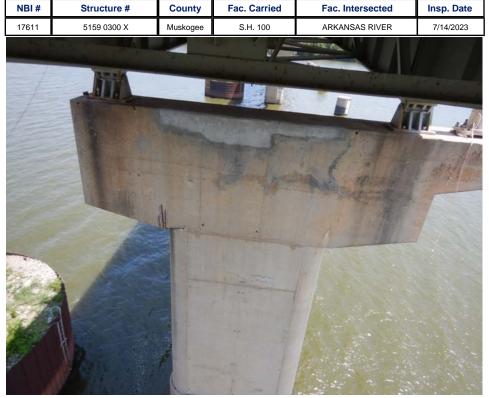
Looking north at pier 4 pier cap south end span 5. Note: scaling concrete around the girder 1 bearing.
